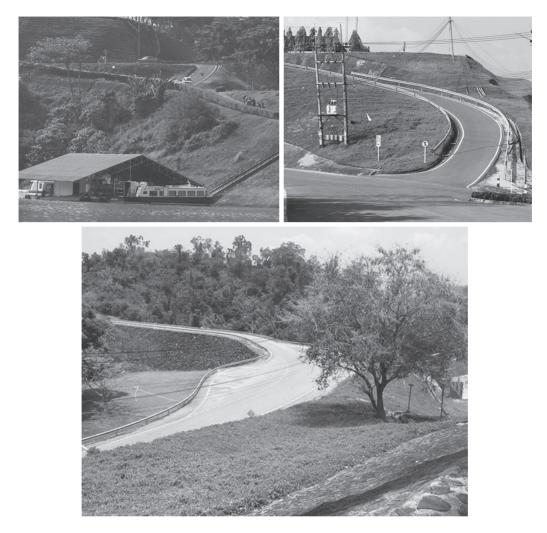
An example of grading for an area to make it suitable for traveling in Rajaprapa Dam
